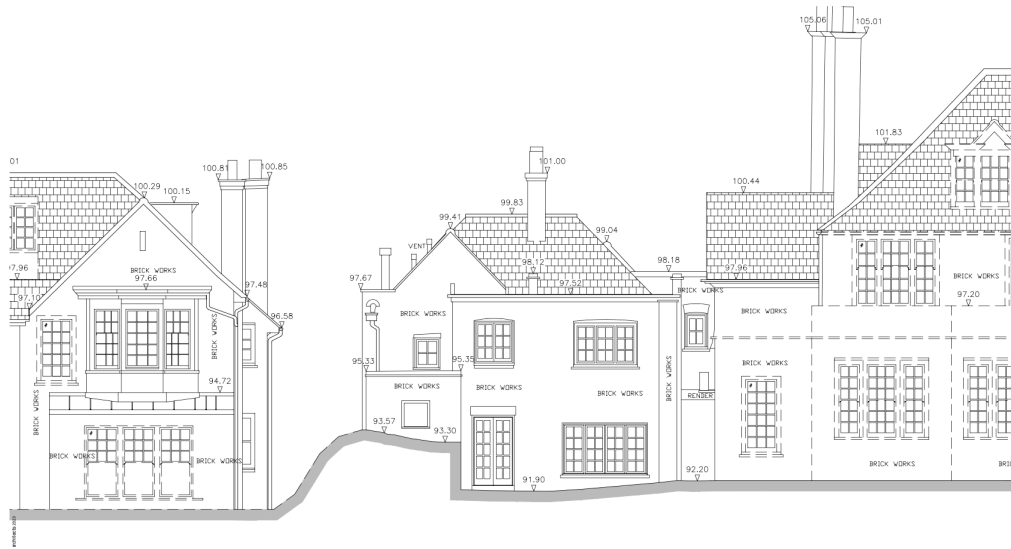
Proposed Rear Elevation of 26A Ferncroft Avenue
